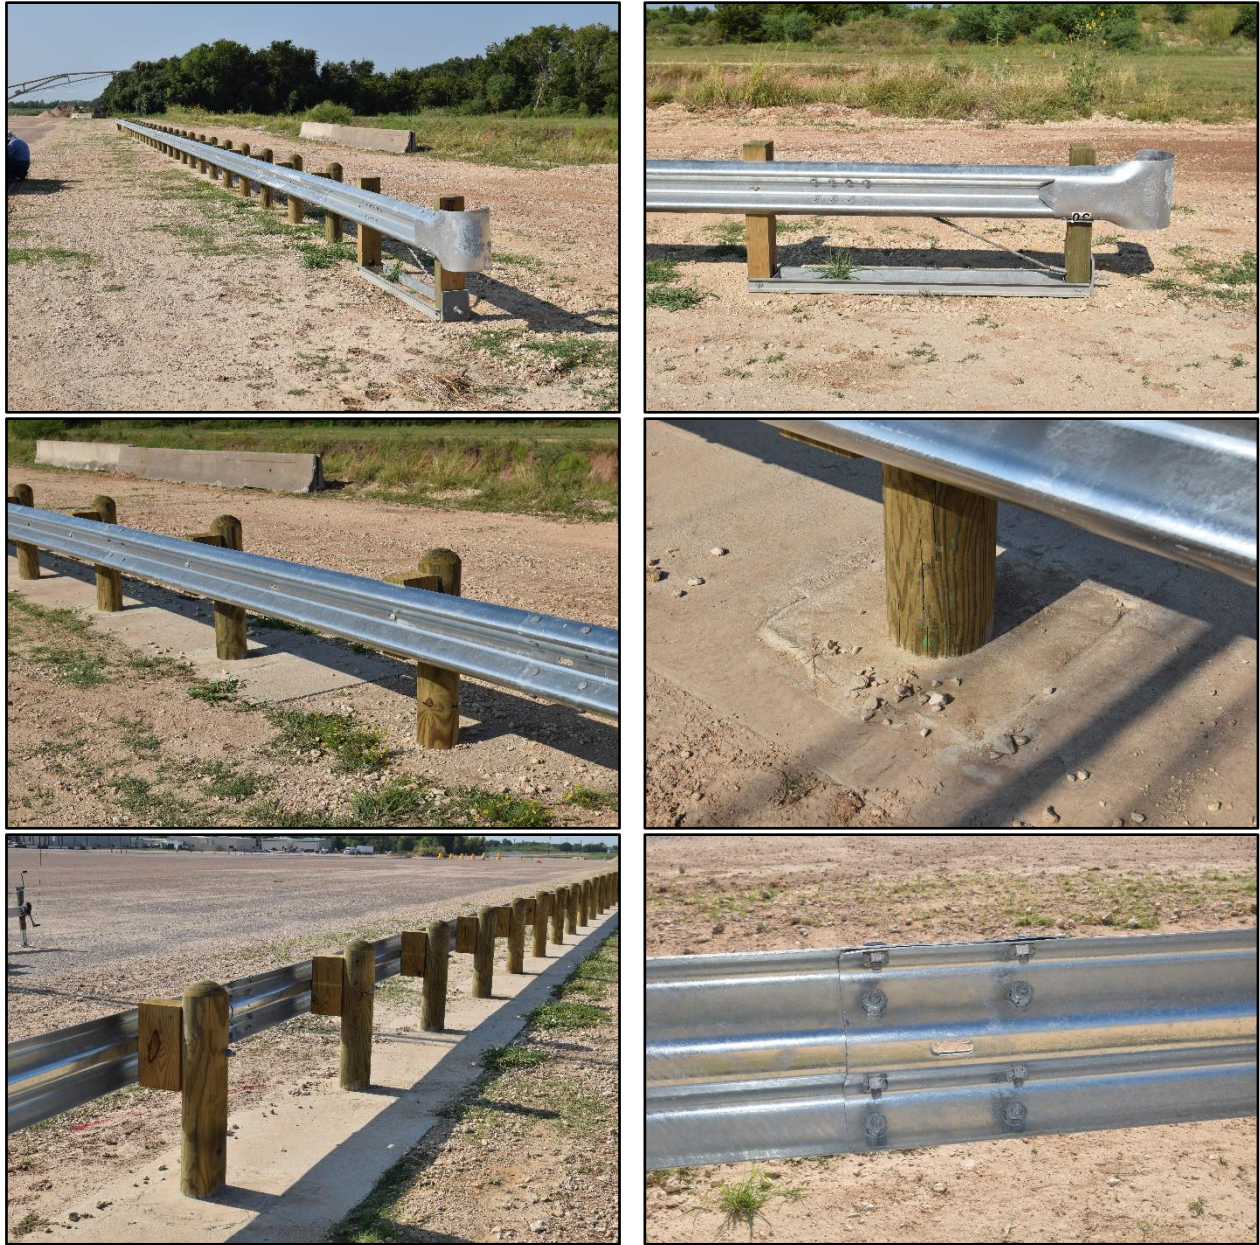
TxDOT W-Beam Guardrail with 7½-inch Diameter Round Wood Posts in Concrete Mow Strip prior to Testing.
